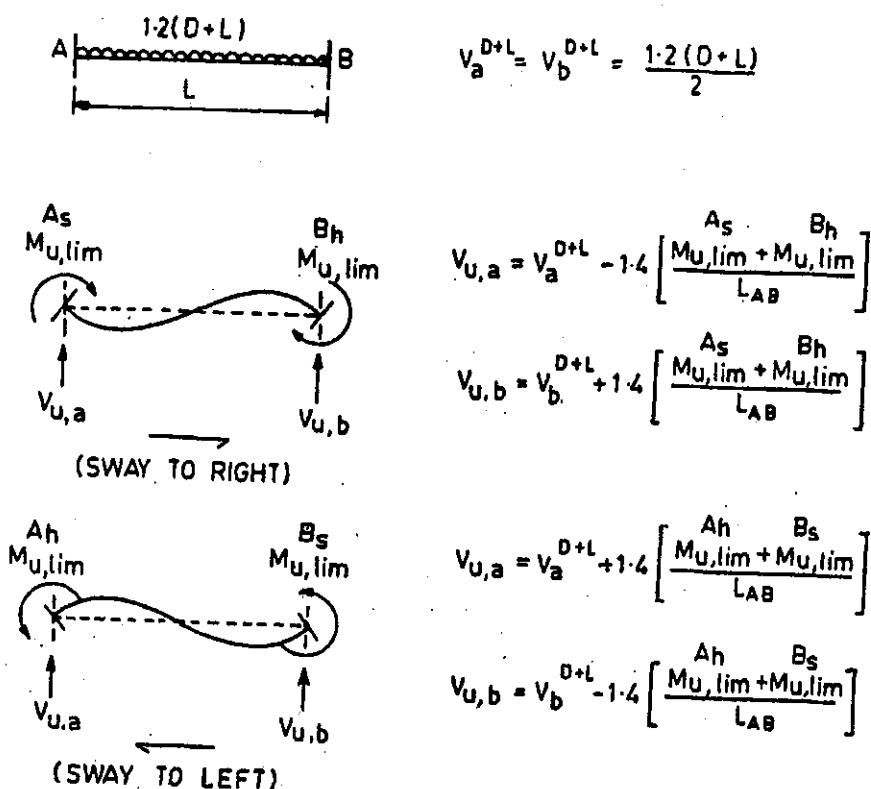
CALCULATION OF DESIGN SHEAR FORCE FOR BEAM
